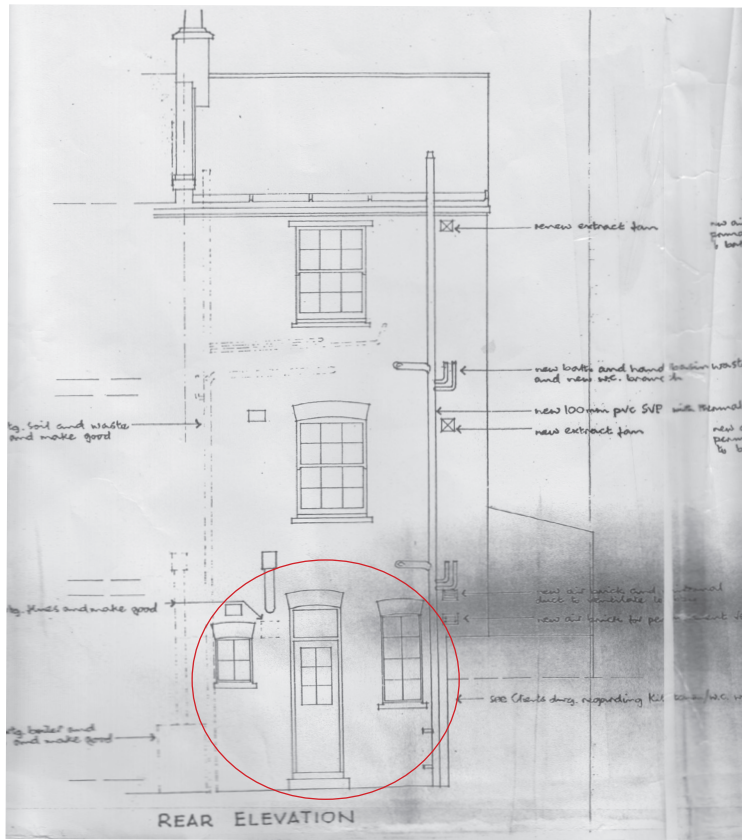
Extract from drawing of Rear Elevation. This archive drawing indicates the former position of the rear door with fanlight over and two sash windows, which we are seeking to refurbish (revA) after inspection by with Graeme Metcalf. Note that sill to kitchen window is lower than indicated in this drawing on inspection and now agrees with neighbours sill level.
